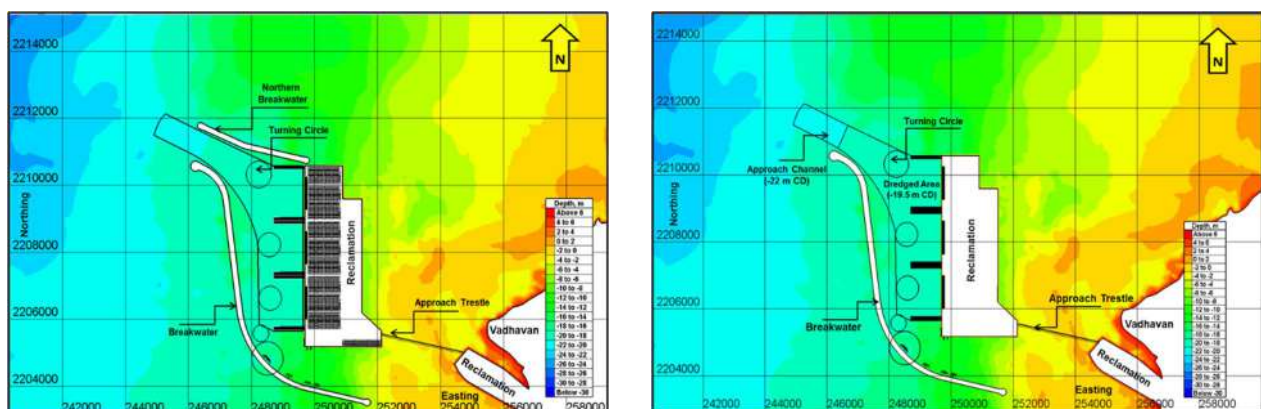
Phase-I Layout of Proposed Port at Vadhavan
